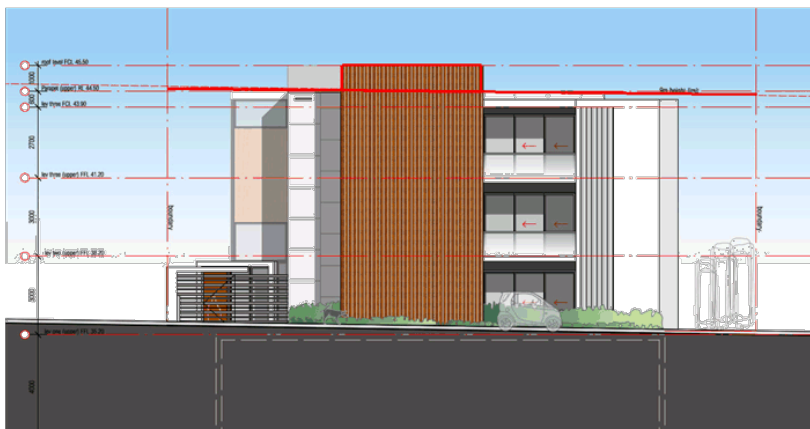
Plan extract of northern façade showing 9m height breach (in red).
